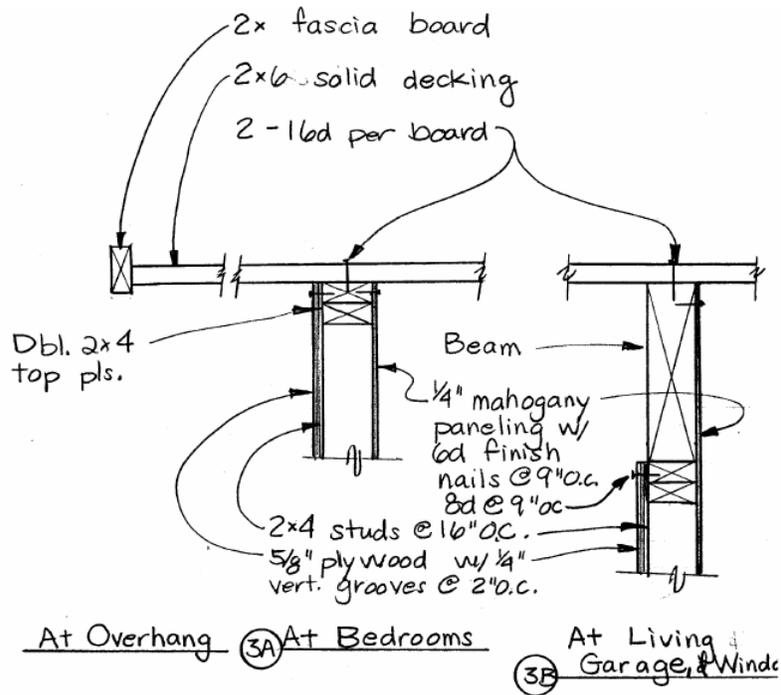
Index building 3 top of exterior wall perpendicular to deck (detail 3-S3)
